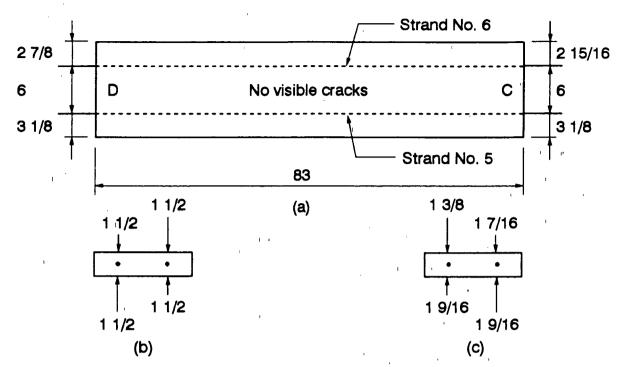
Specimen No. 3-3.0TC-9 (dimensions shown in inches):
